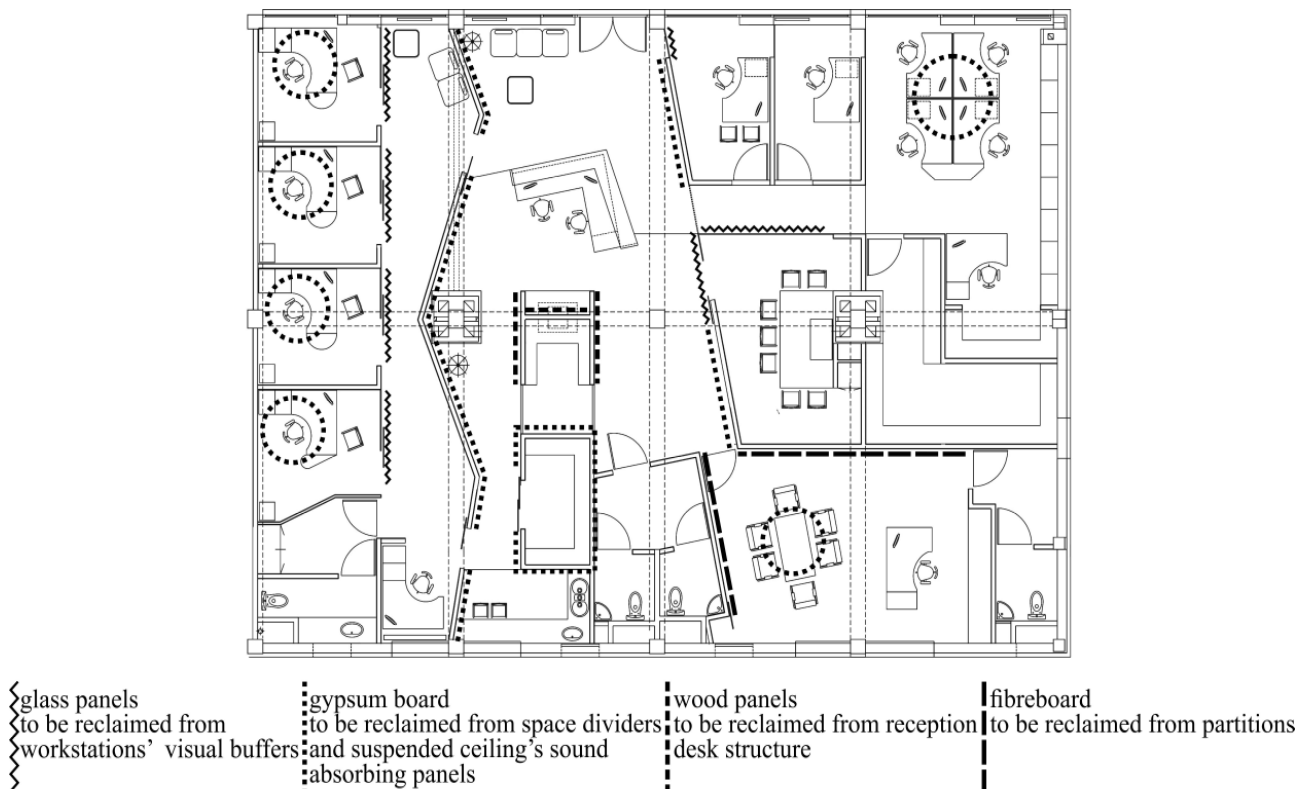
Resources management scheme for a refurbished open space office (Source: author's drawing).
